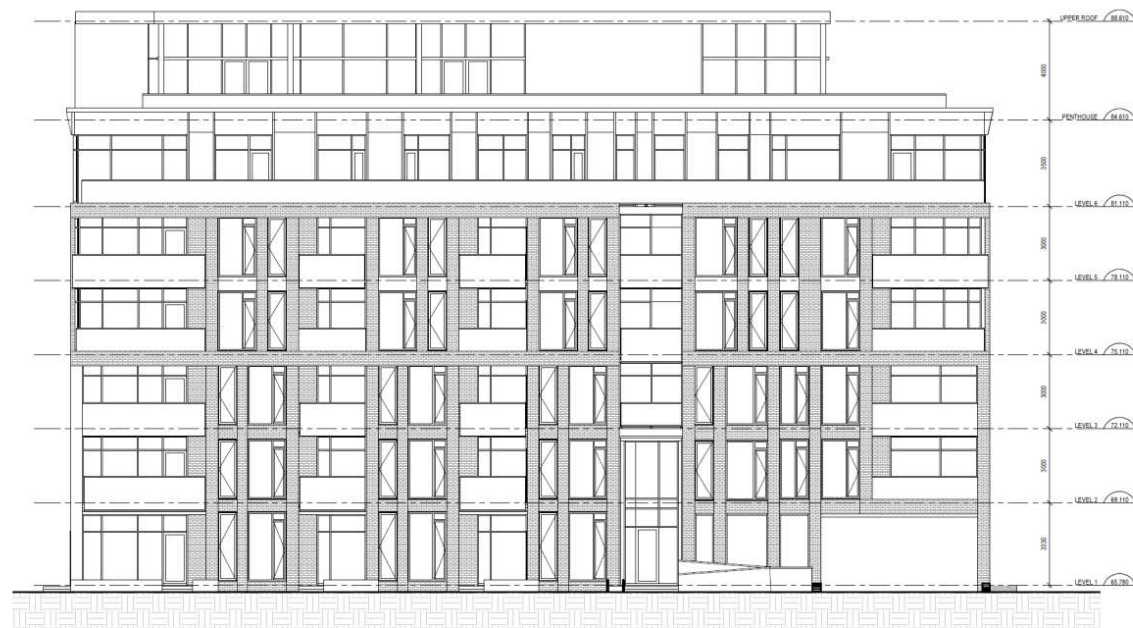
West elevation of proposed residential building (Source: Project1 Studio).
